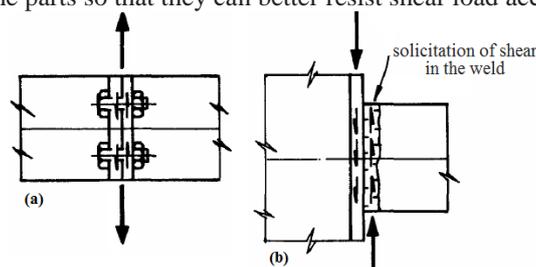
Strain to shearing joints (a) screwed and (b) welded
